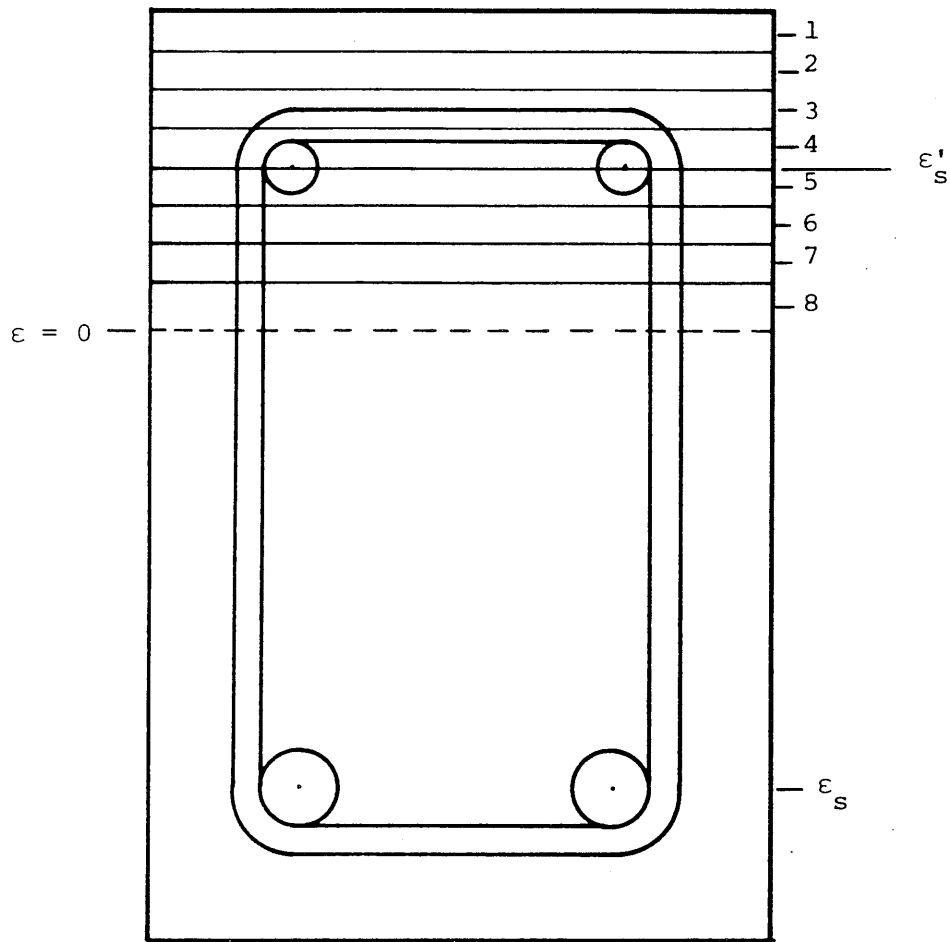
Beam J-2 cross section at yielding stage (Case 2).
